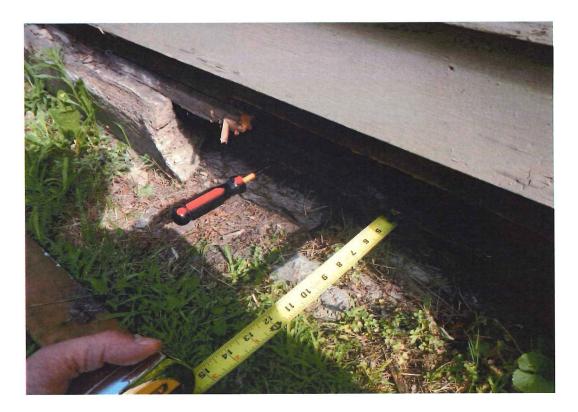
Rotted wood and missing/deteriorated stone materials at base of stud wall
